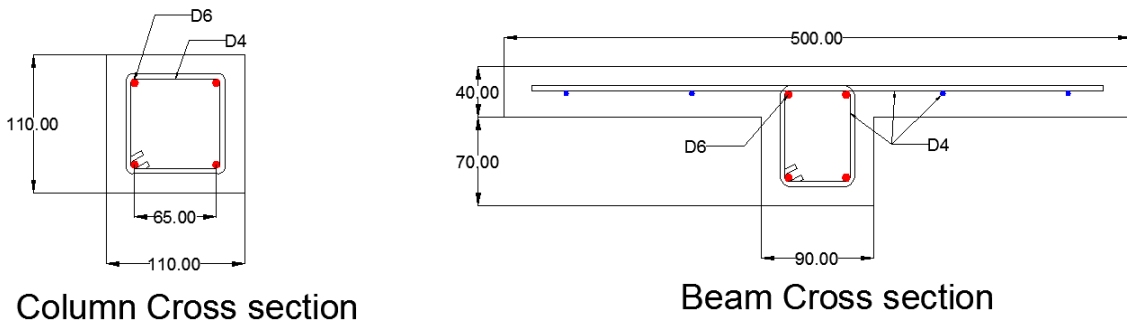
Cross Section Detail of Column and Beam (all dimensions are in mm)
